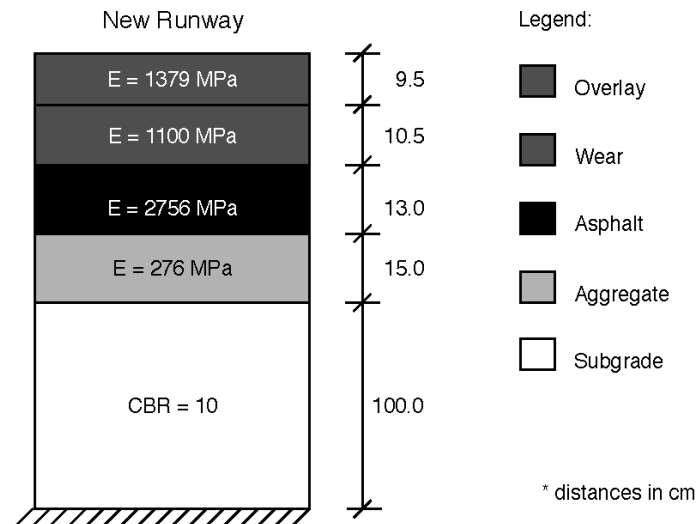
Final structure dimensioned (loss of structural capacity) - Medium Jet Airliners
